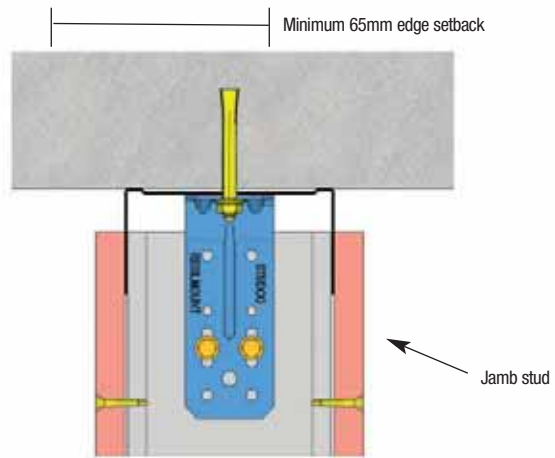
M103 Connection Detail for 150mm and 92mm Jamb Studs
